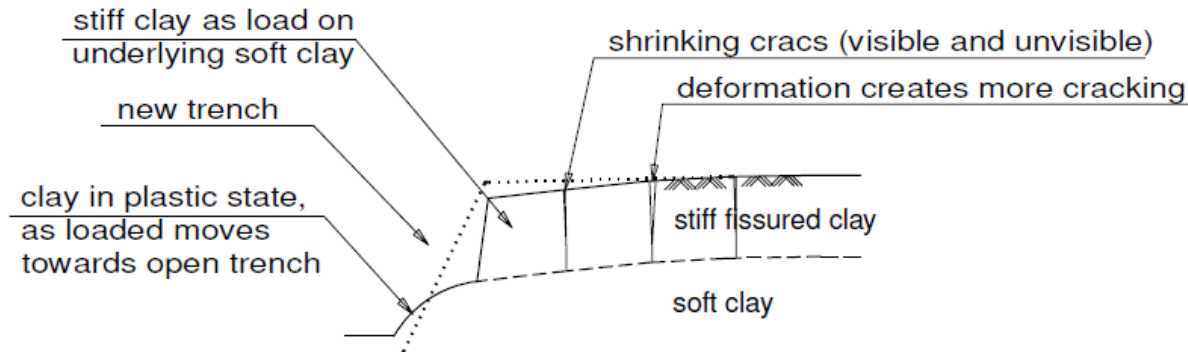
Visual demonstration, overlying material stiff clay. New cracs due to excavation.
